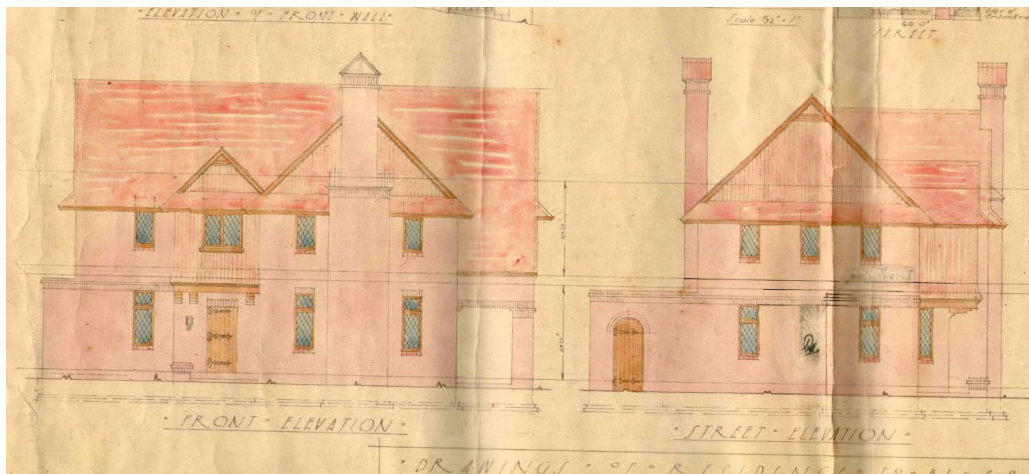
Principle elevations of 8 Pine Hill Avenue, Double Bay, 1925, not listed.
